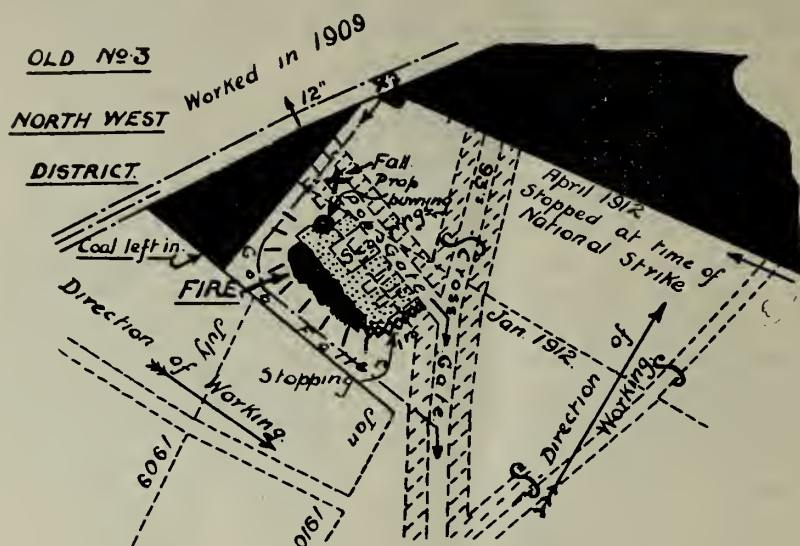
HICKLETON MAIN COLLIERY (Q. 12,280). SKETCH PLAN SHOWING POSITION OF FIRE REFERRED TO.
